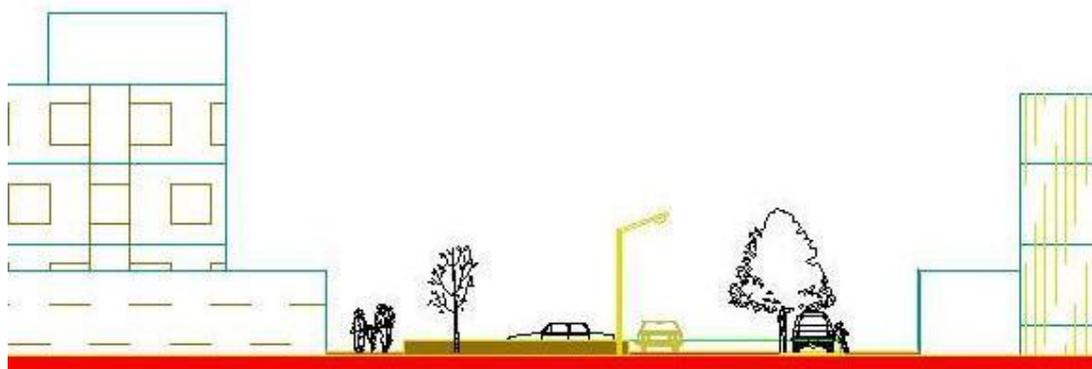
25: Street Cross-section (Home Zone) – Proposed Scheme, El-Muchkat-II
